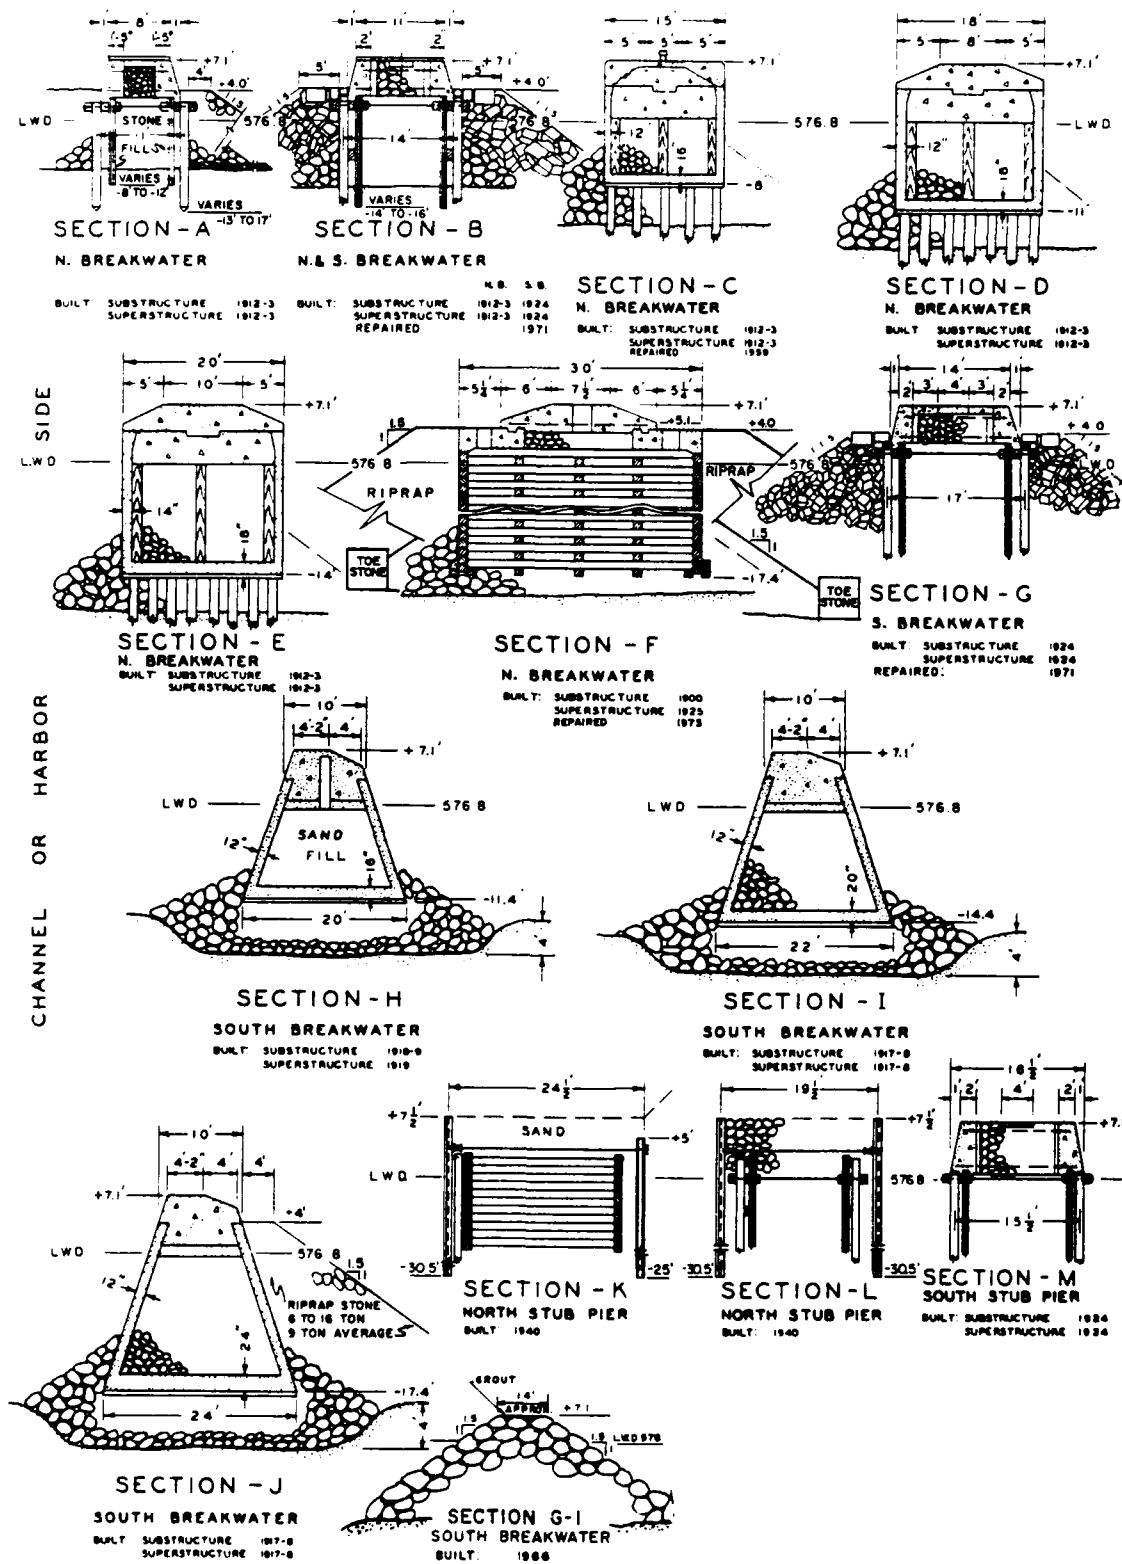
Typical breakwater and pier cross sections, Racine Harbor, Wisconsin
